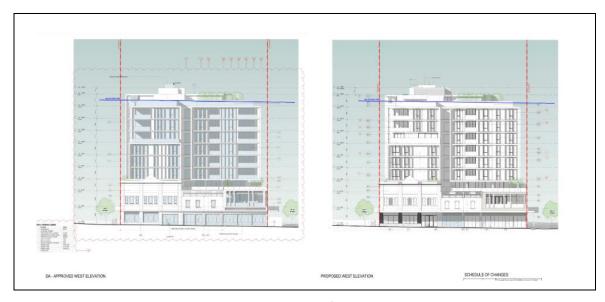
Comparison west elevation showing modification to approved plant area as viewed from Bronte Road frontage (previous approval scheme on left, proposed scheme on right)
